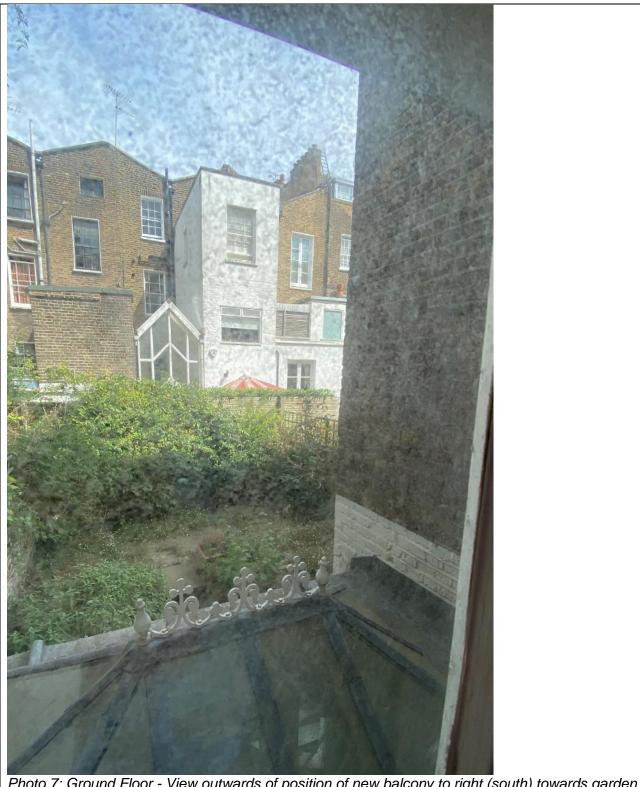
Ground Floor - View outwards of position of new balcony to right (south) towards garden of no.24.
